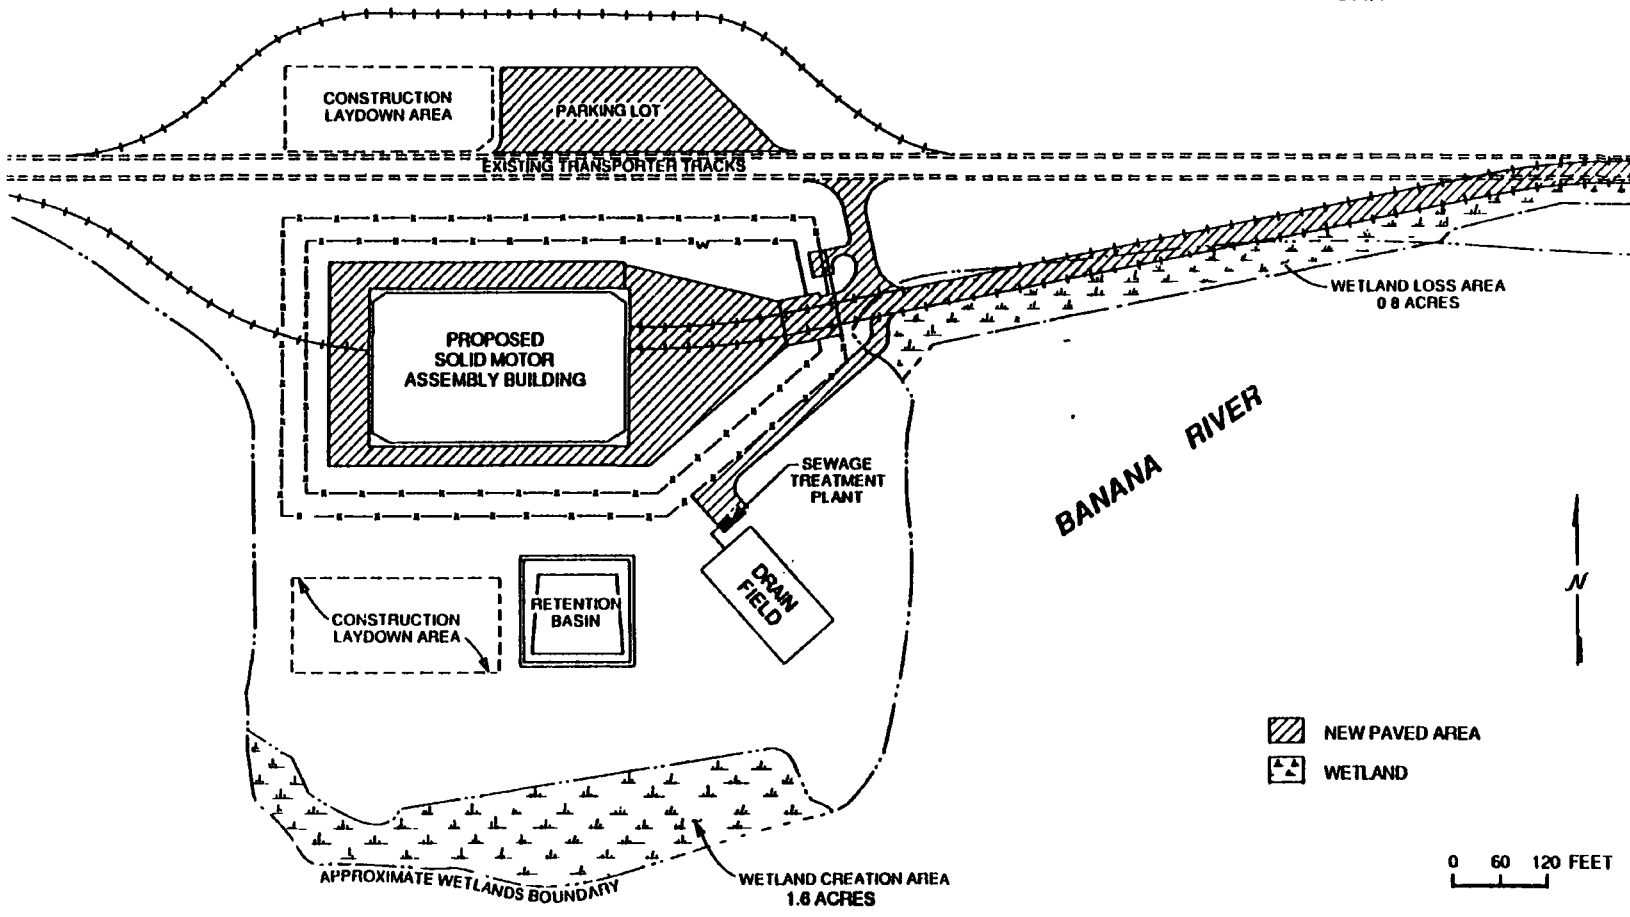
Proposed layout of the new Solid Motor Assembly Building site.
